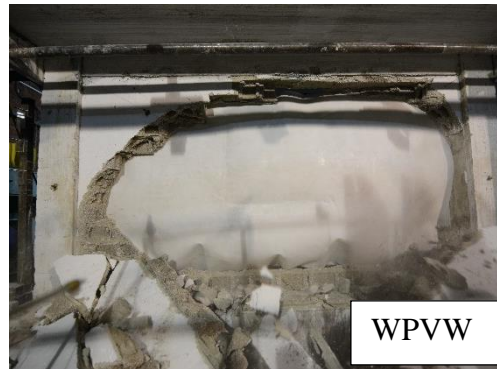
Failure State of Pumice Concrete Infill Walls
